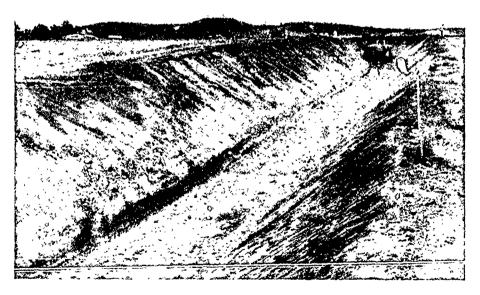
Upstream face of right abutment inspection trench Approx. sta. 66+50 to 69+00, looking east.
